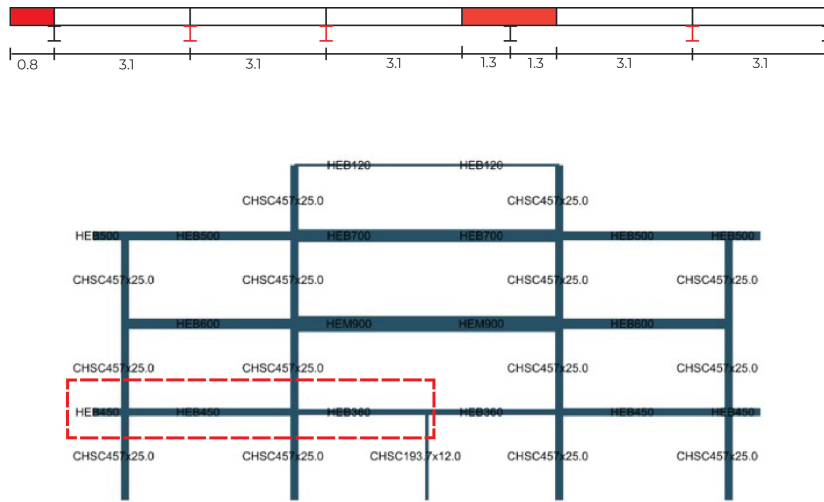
Cross-section of the floor slabs in the new design (left side till mid-column)
